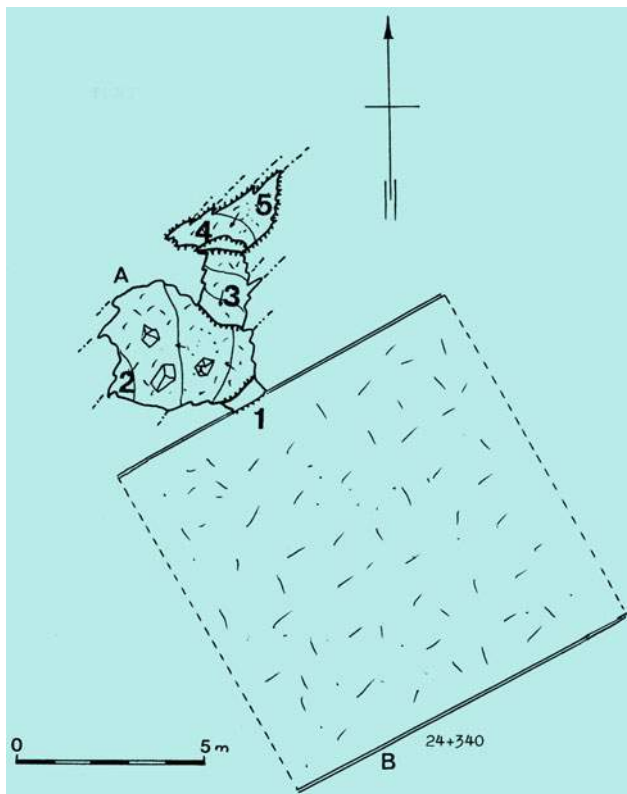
Plan of cavern at km 24 + 340 in Tuhobić Tunnel
